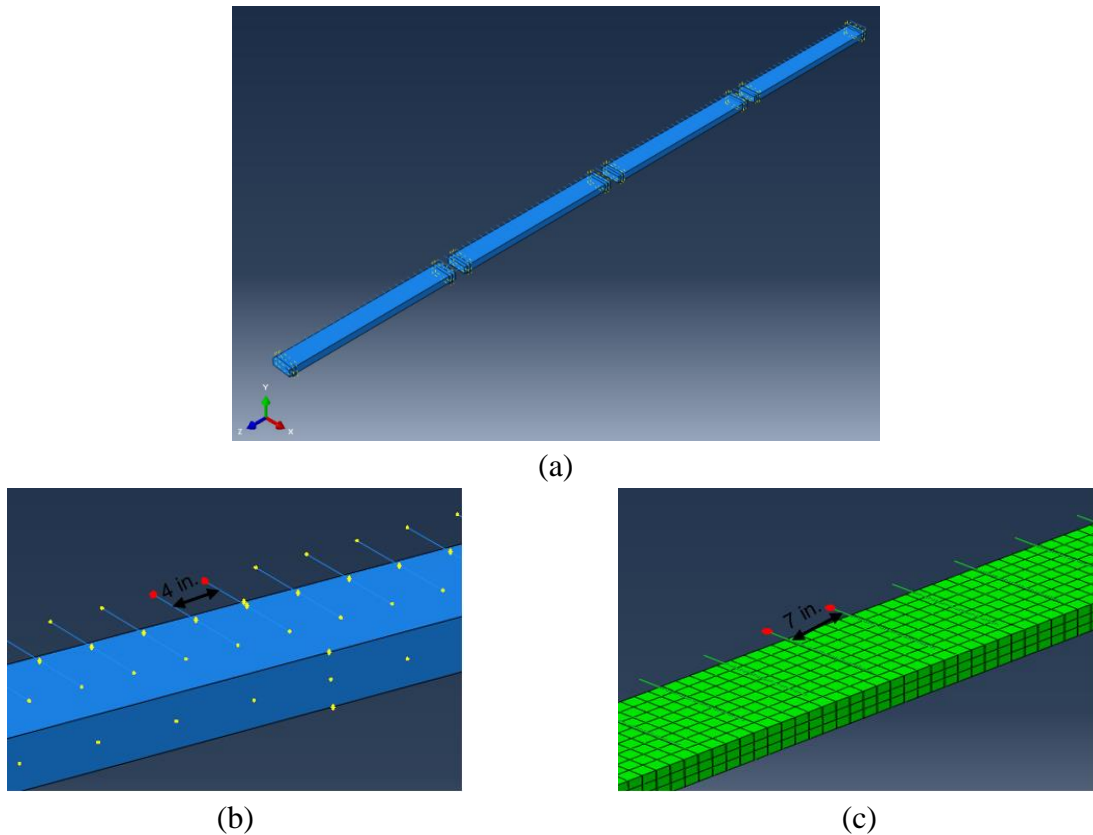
FE model view: (a) Full model; (b) 4 in. spacing; (c) 7 in. spacing
